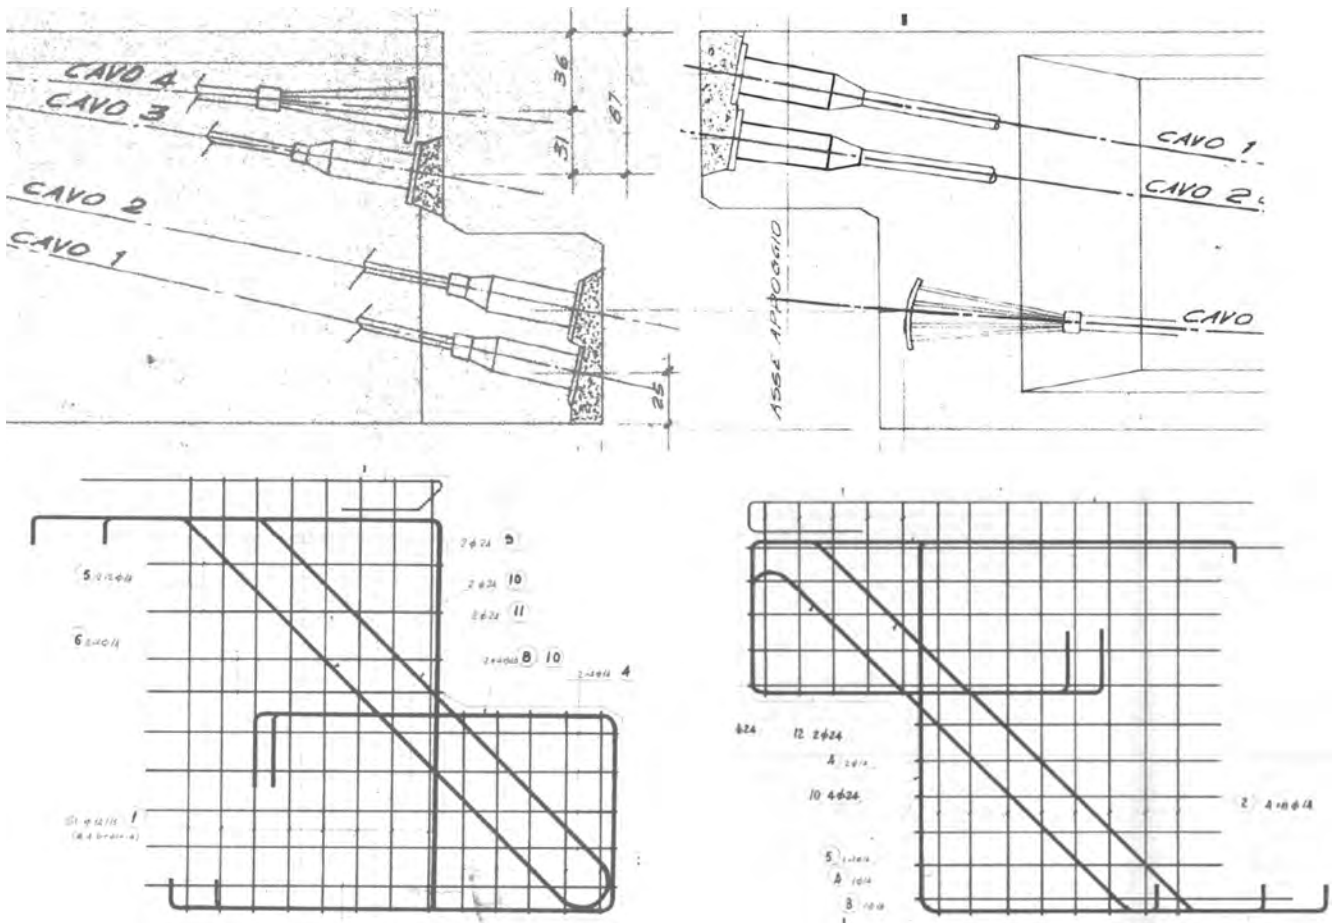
Prestressing tendon configuration in the saddles and ordinary reinforcement arrangement
